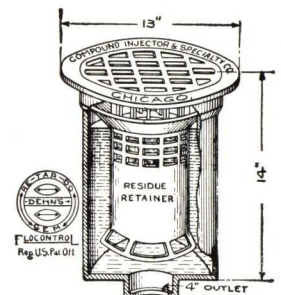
A—Furnished with 4-in. iron pipe threaded bottom outlet, iron top and strainer. Heavy Duty. Each \$26.00.
